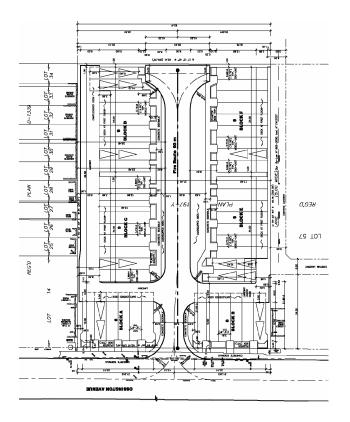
Site plan and elevation of the proposed 1145 Ossington Avenue development
